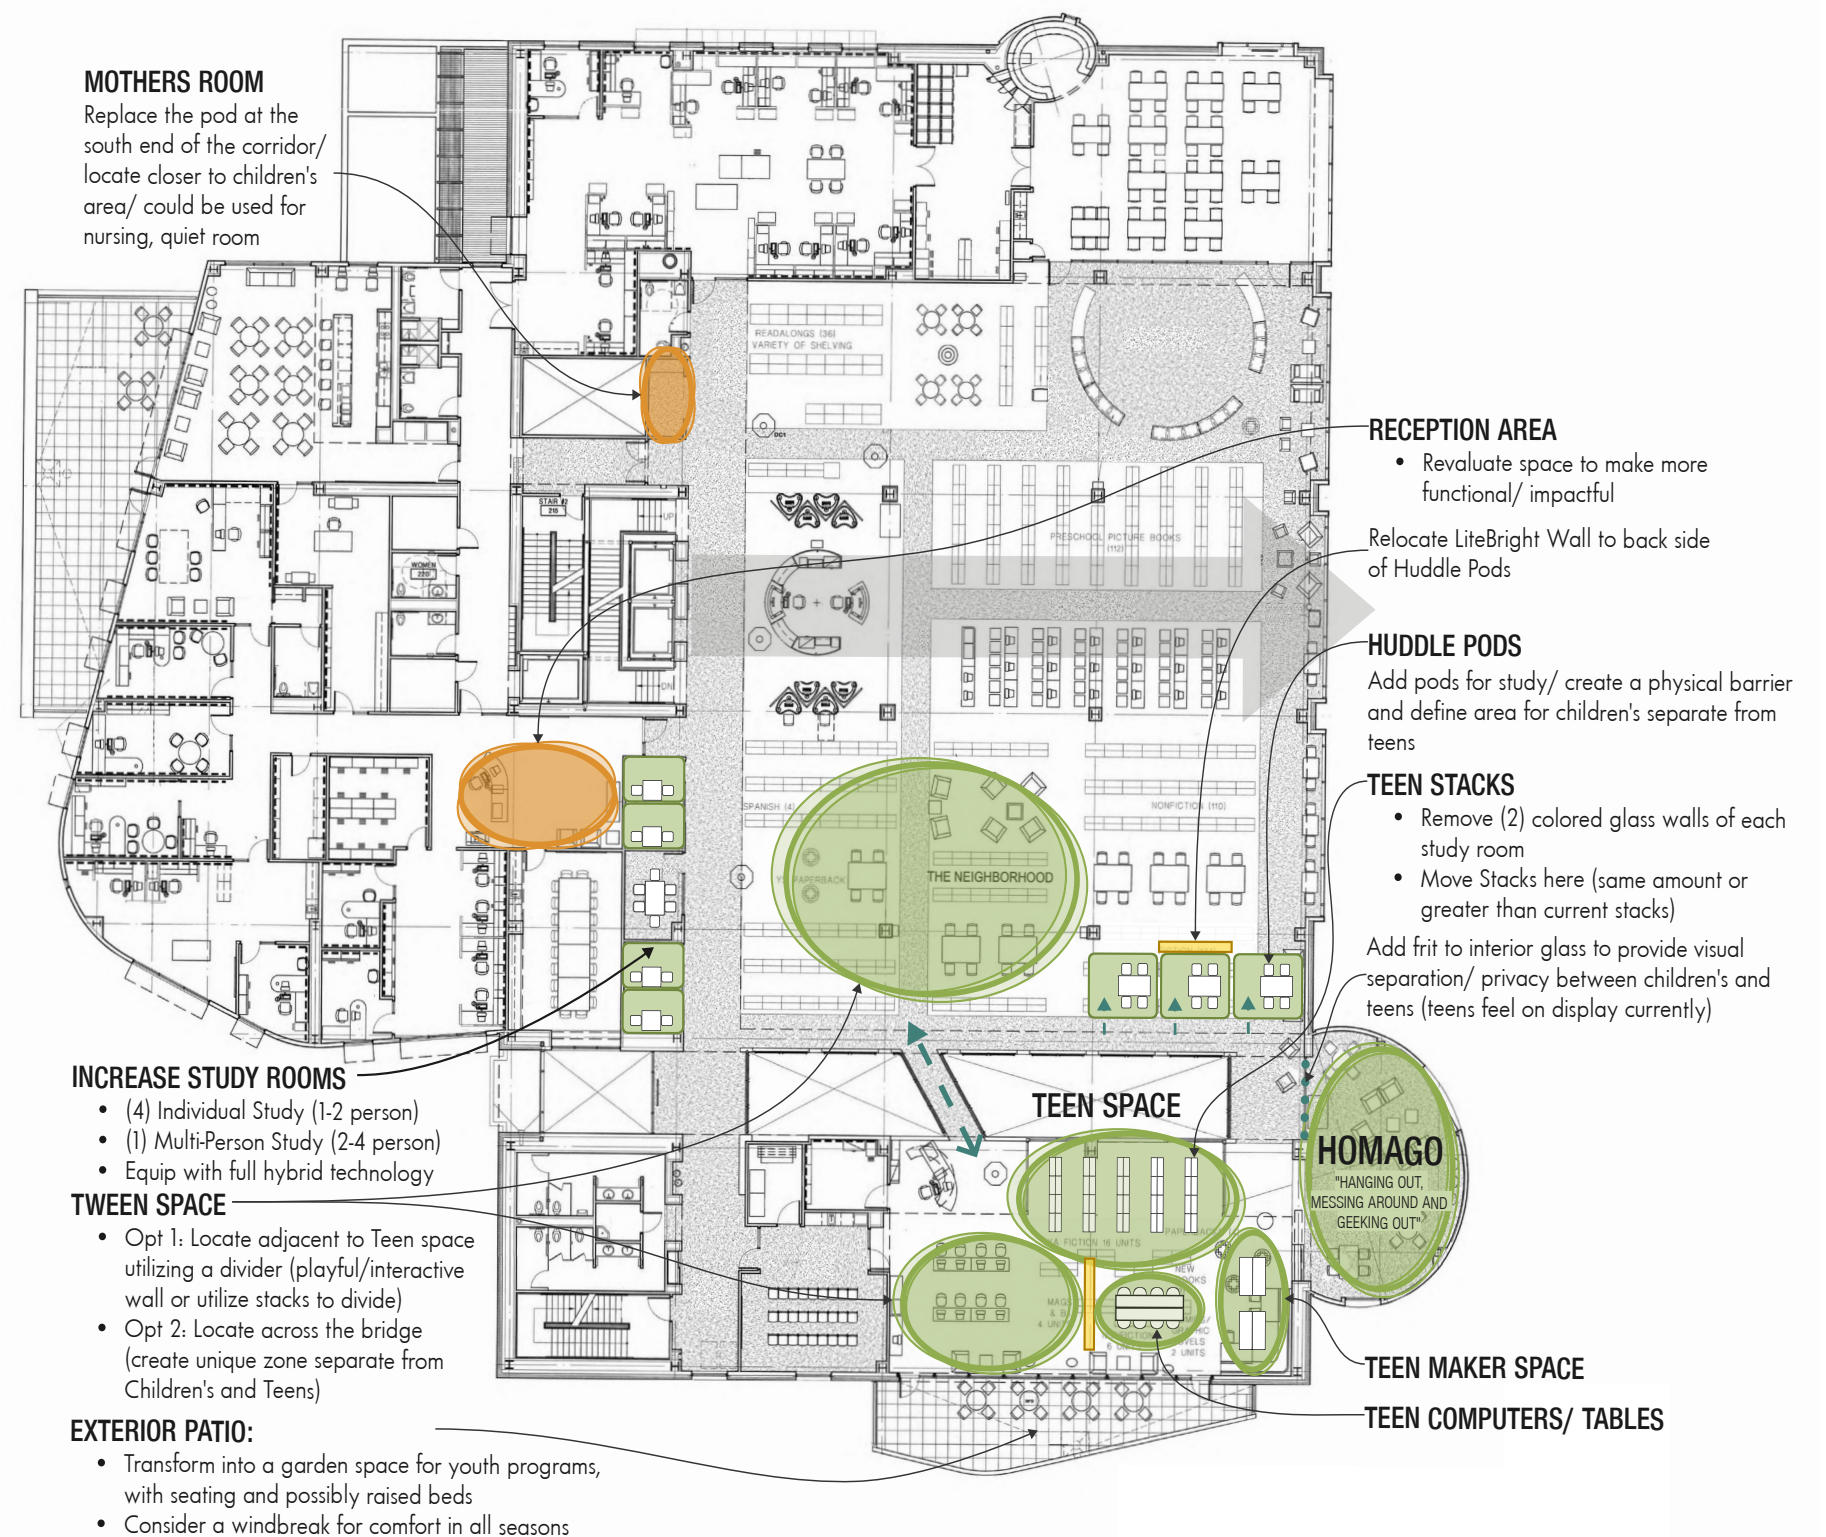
CHEYENNE BRANCH , SECOND FLOOR PLAN, OVERLAY BY JLG ARCHITECTS
